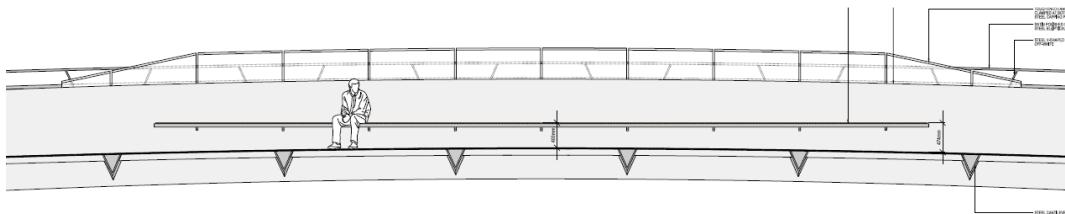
Proposed glazed screen around the benches at the mid-span (not to scale)
